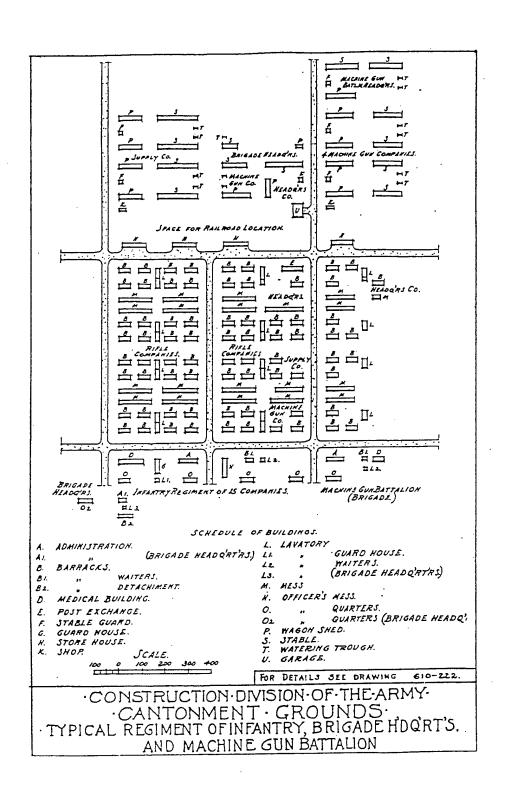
Cantonment Grounds, Typical Regiment of Infantry, Brigade Headquarters, and Machine Gun Battalion. Source: Manual of the Construction Division of the Army, Section C, Engineering Division, 1918.
